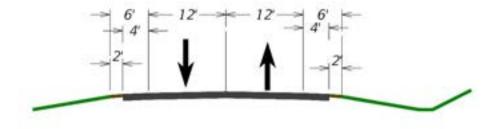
BARDWELL HILL PROPOSED TYPICAL
